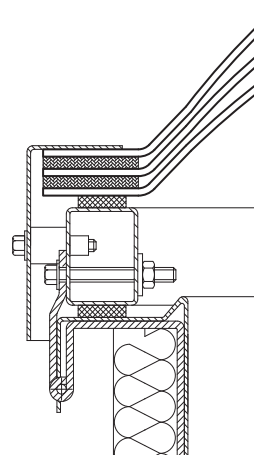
Vent section, glazing: triple-layer acrylic dome
